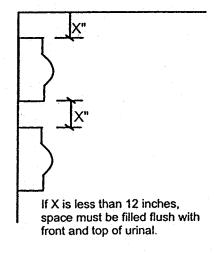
Spacing between wall hung or stall type urinals.
